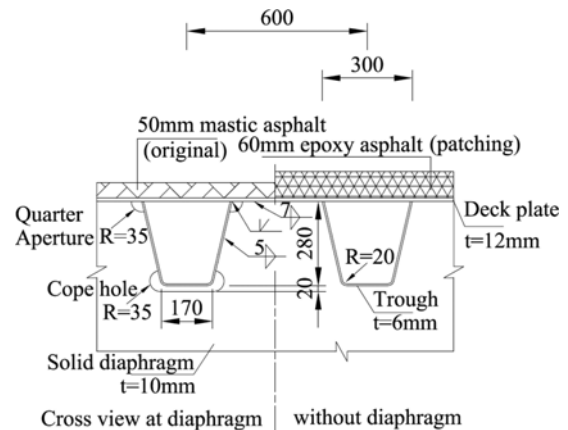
Structural details of orthotropic steel deck (Unit: mm)
